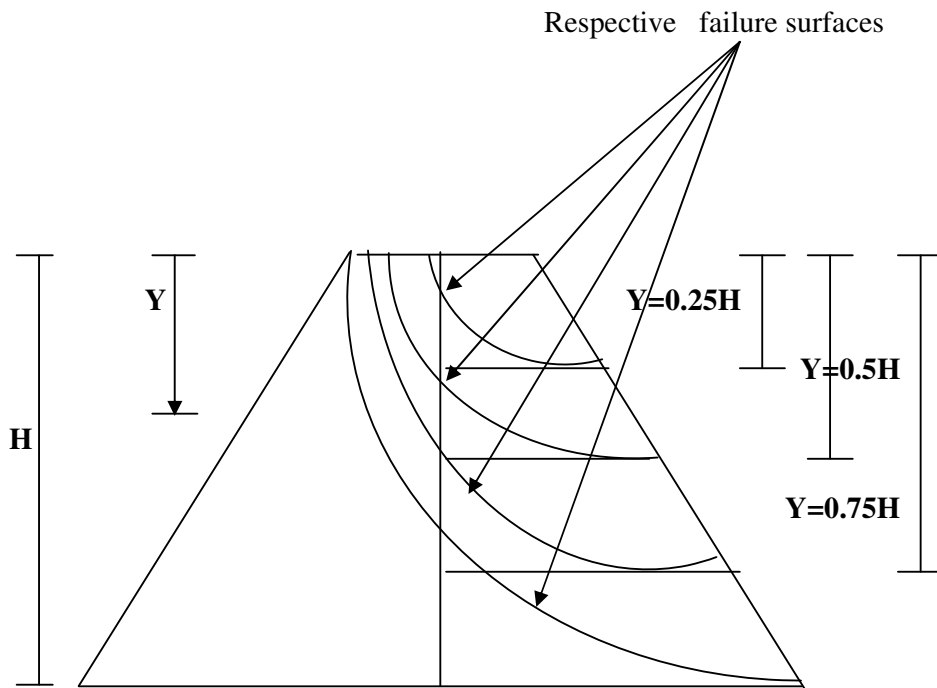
Typical Dam Section for Different Failure Surfaces
